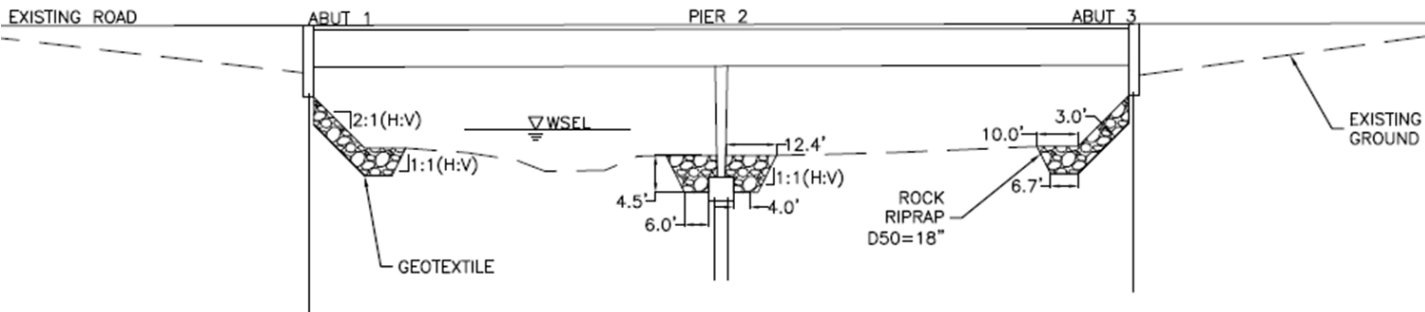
Cross-sectional view of Bridge A-24-AO with recommended hydraulic scour countermeasures
